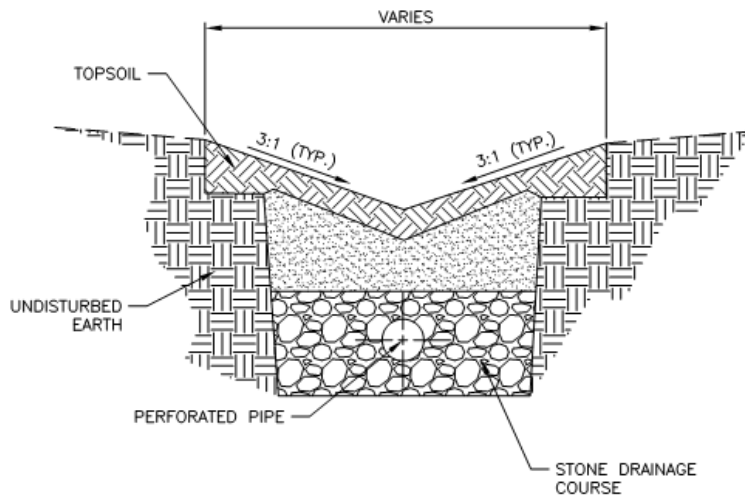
Typical Hybrid Ditch Cross-Section
